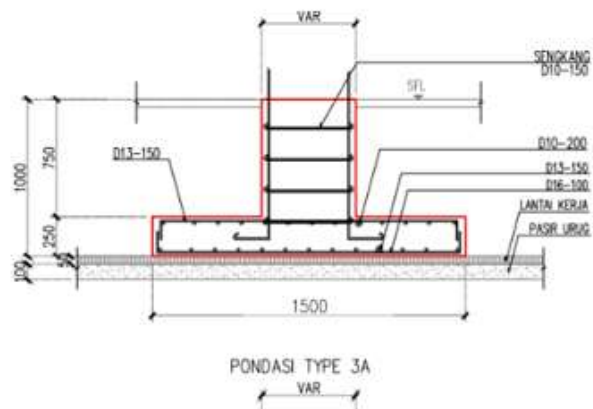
Type 3a Foundation: Longitudinal or Continuous (Strip) at A Depth of -2.20 M
